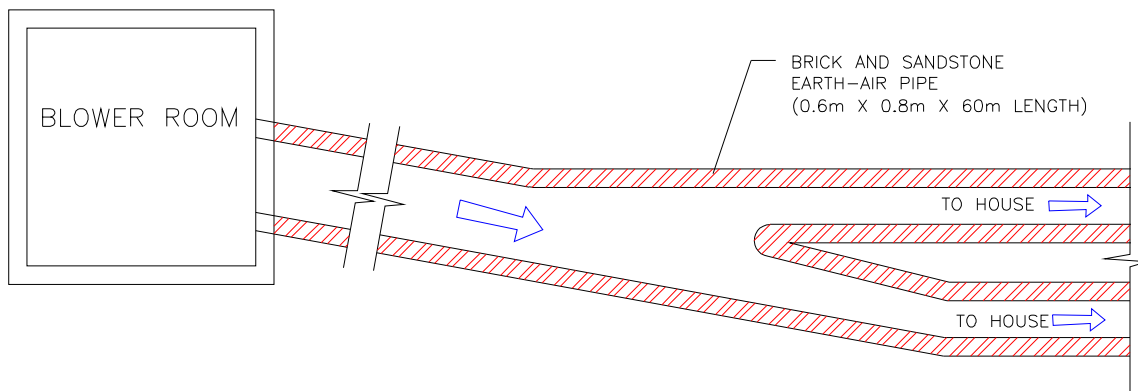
Sketch plan of earth-air pipe system at the Dilwara Bagh House, Gurgaon
